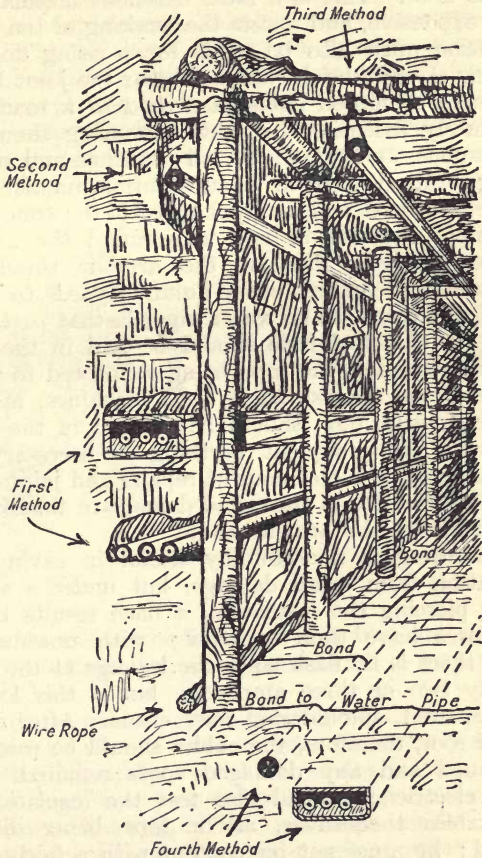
METHOD OF RUNNING CABLES IN ROADS.
